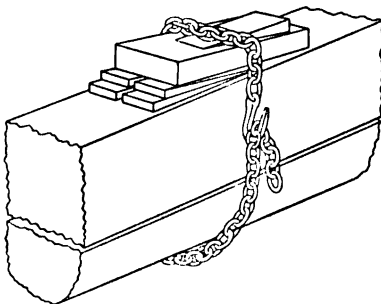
Blasting timbers and method of attaching to wall plates. (*Trans. A. I. M. E.*)
